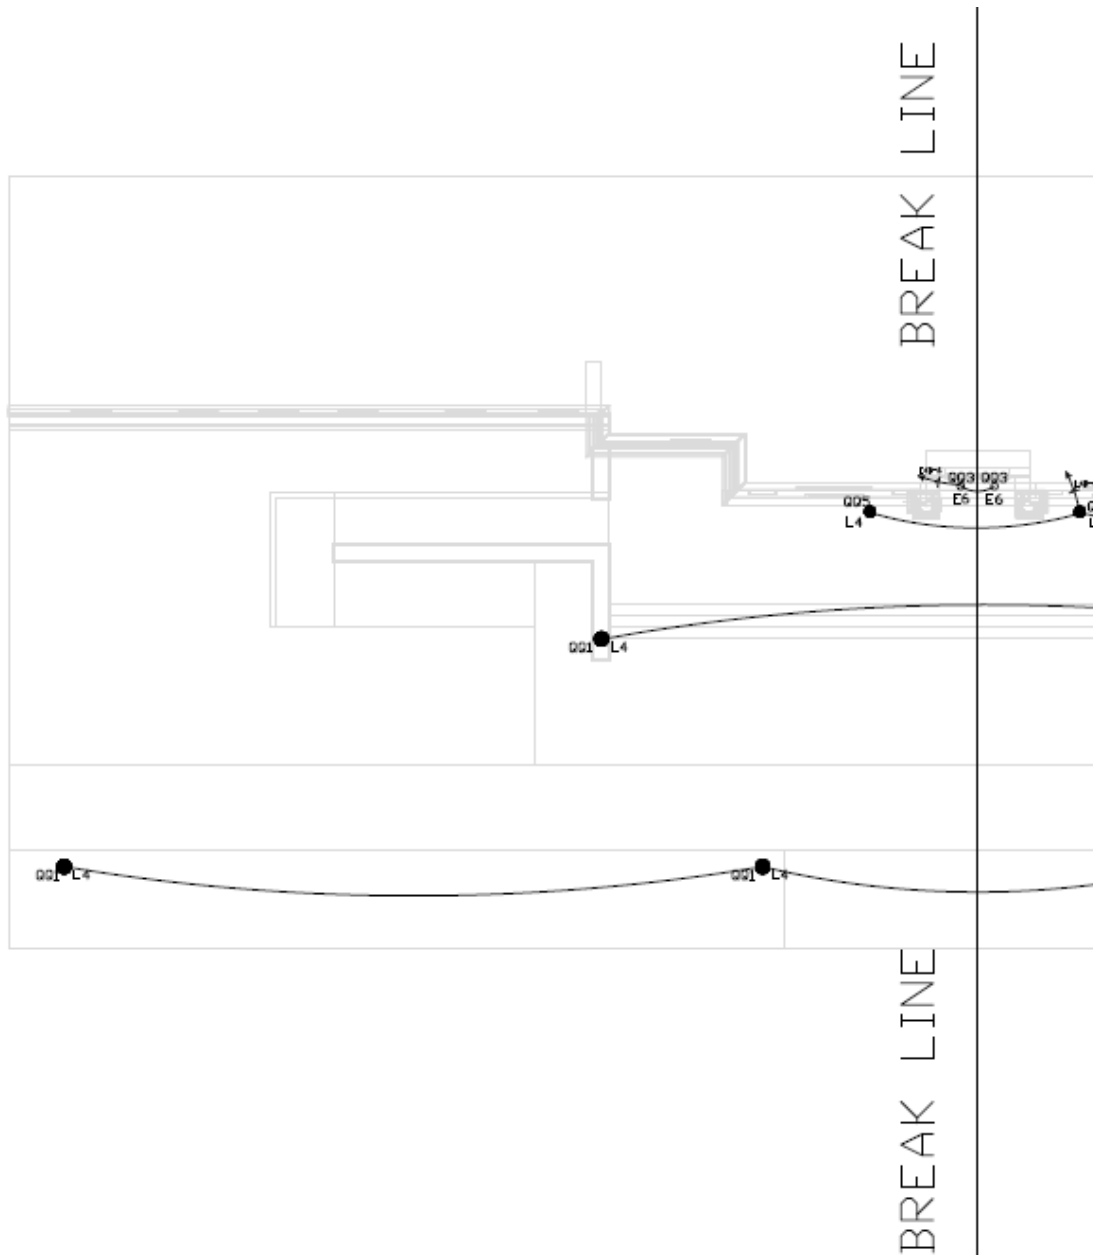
First Floor Circuited Plan for East Entry and Façade – South Of Entrance
